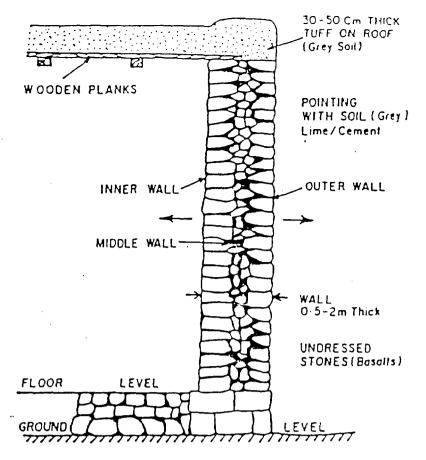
Typical Detail of Conventional Buildings with Stone Wall (Ref-4)
